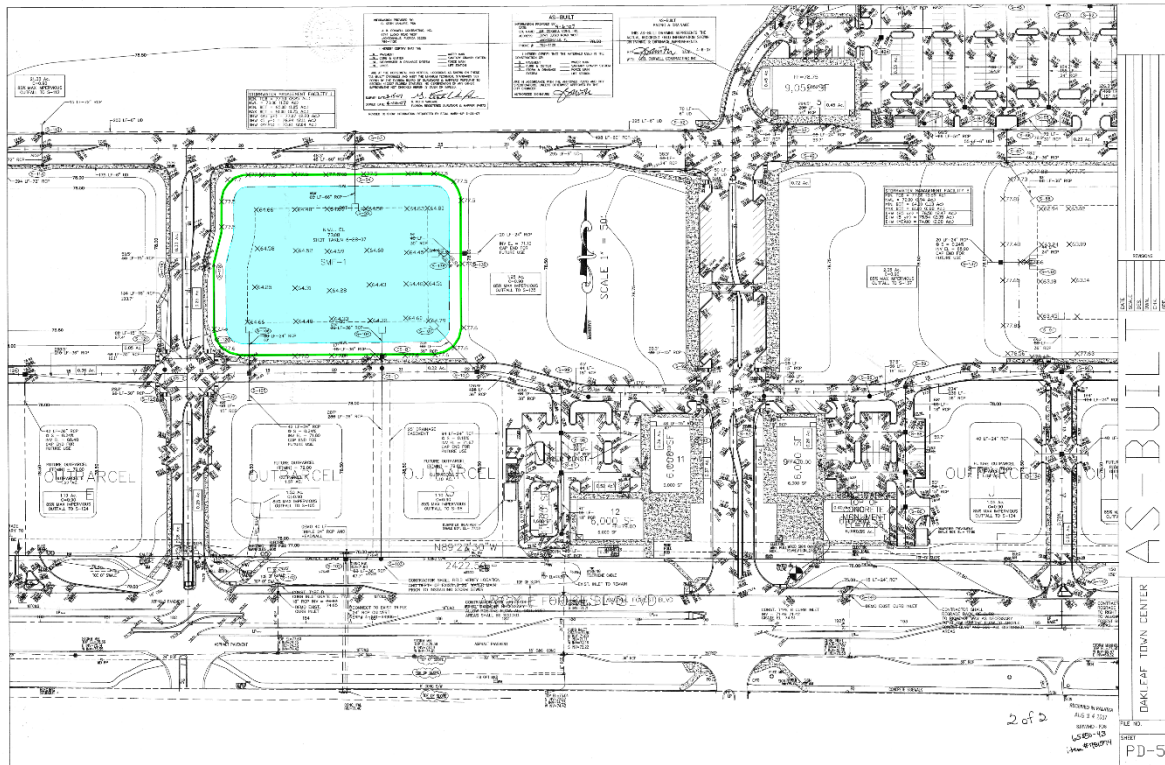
OAKLEAF TOWN CENTER AS-BUILT PLANS
